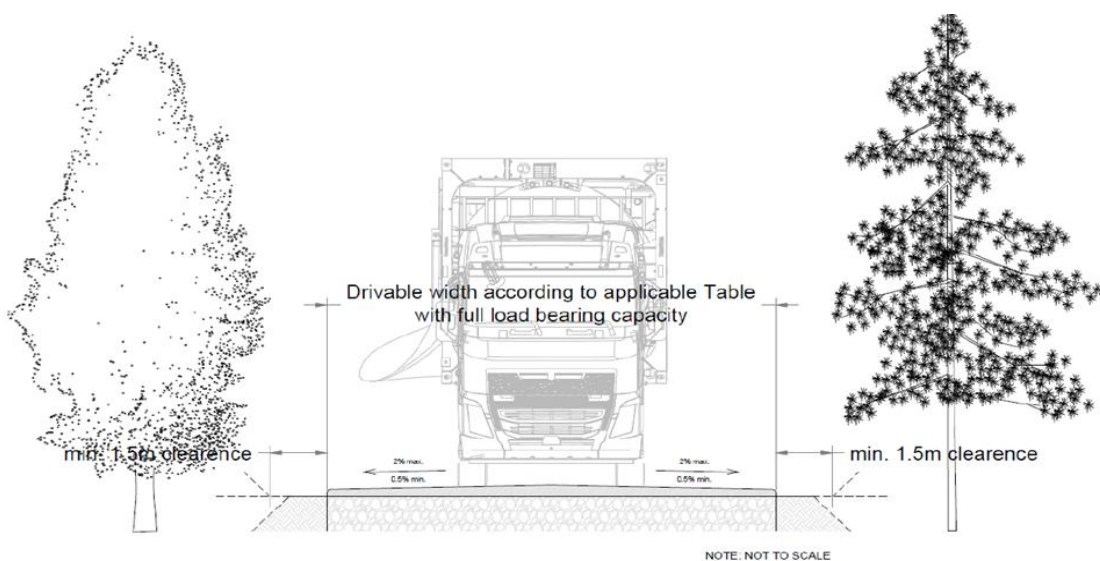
Typological Examples of Access/Site Road Cross Sections
